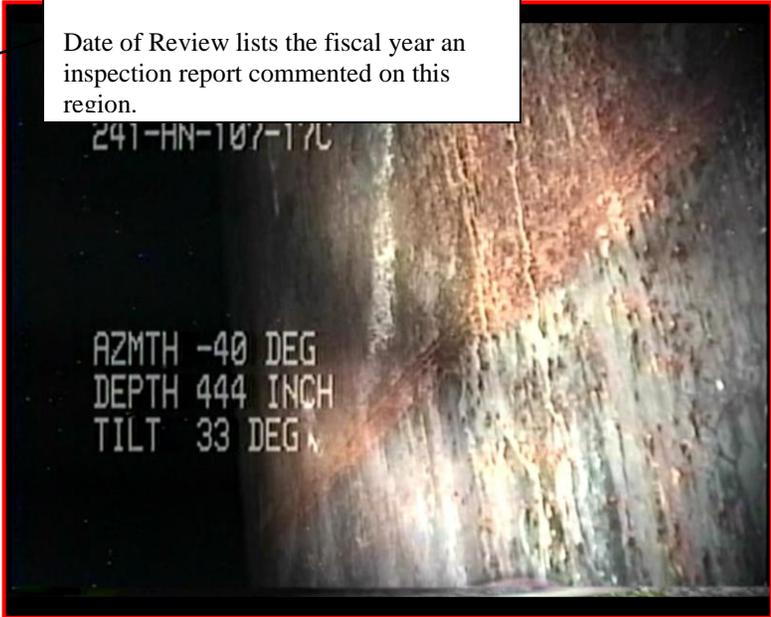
AN Tank Integrity Inspection Guide Example.
